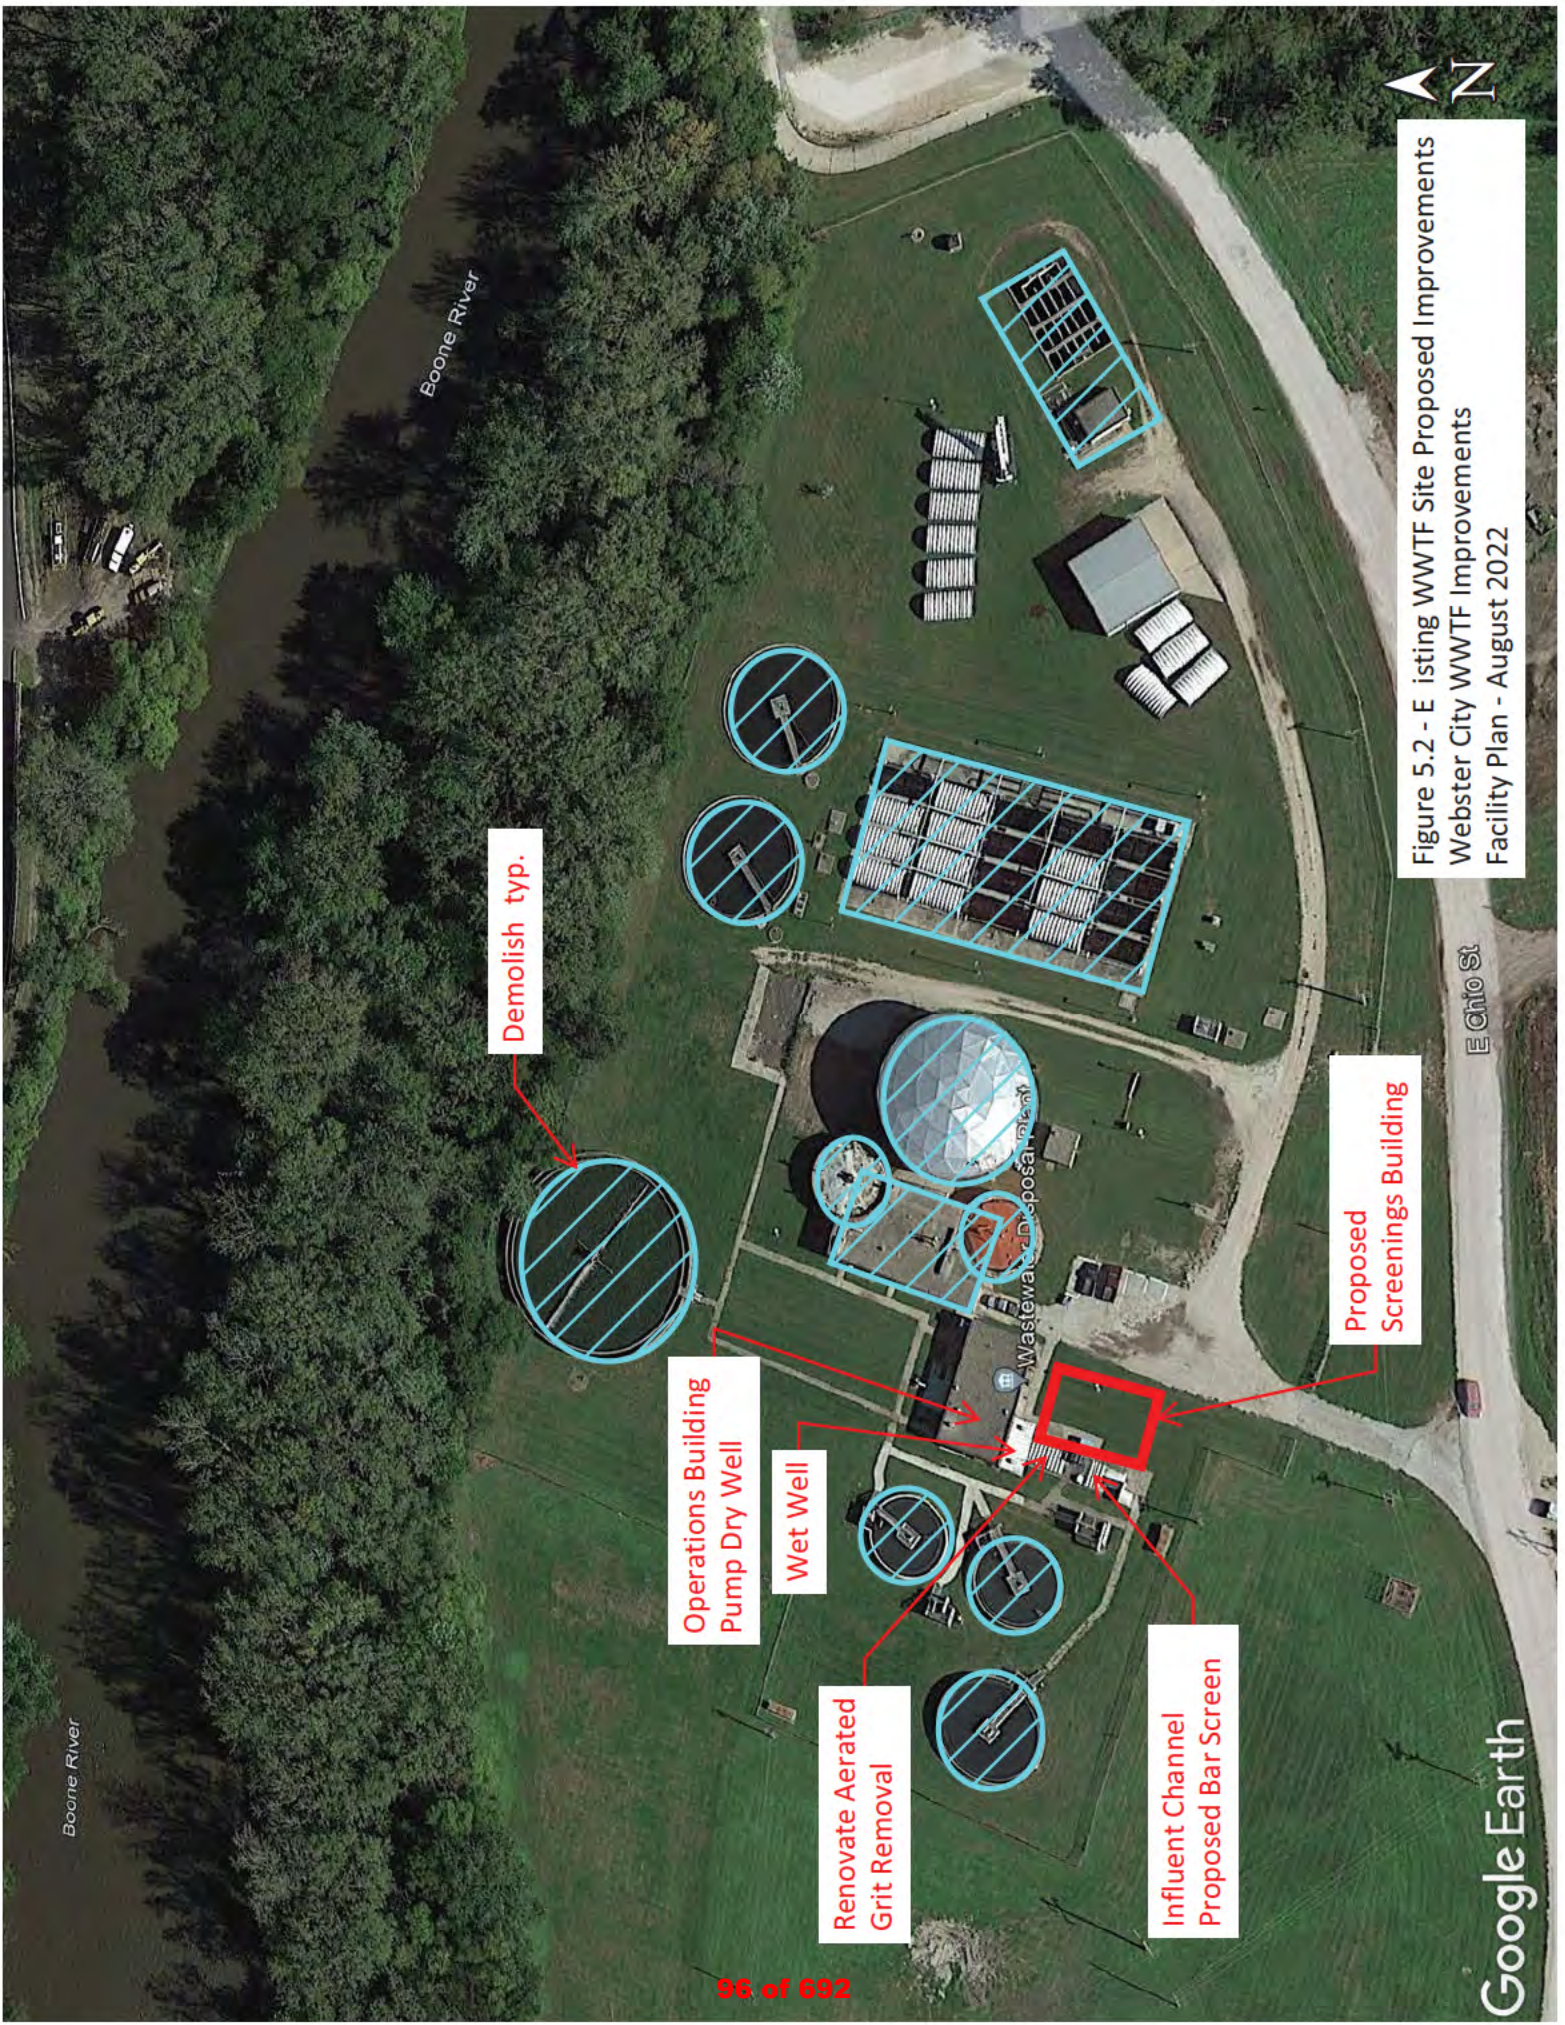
Existing WWTF Site Proposed Improvements
